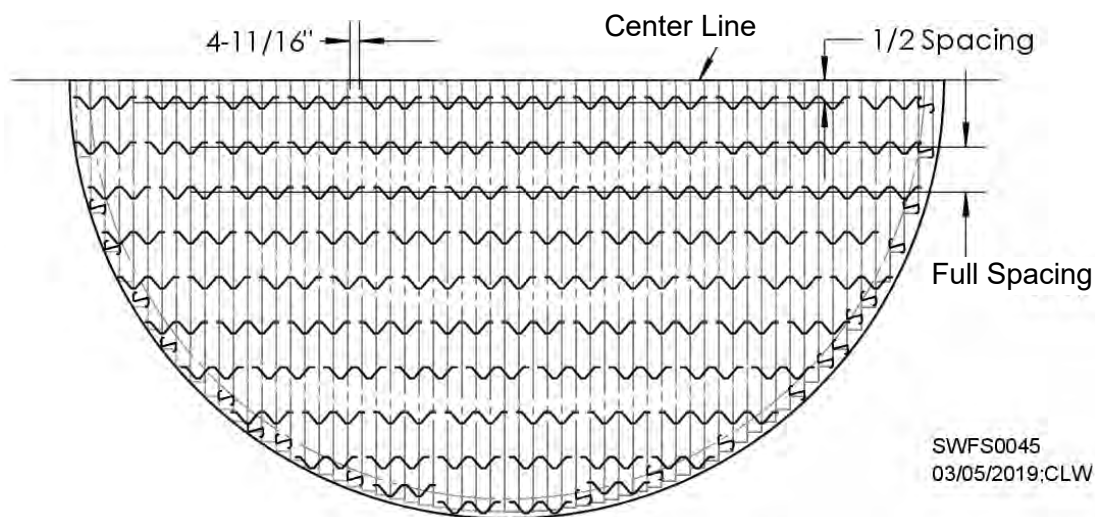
Typical SuperWave spacing in 36' dia. bin w/ Hawk Cut flooring
